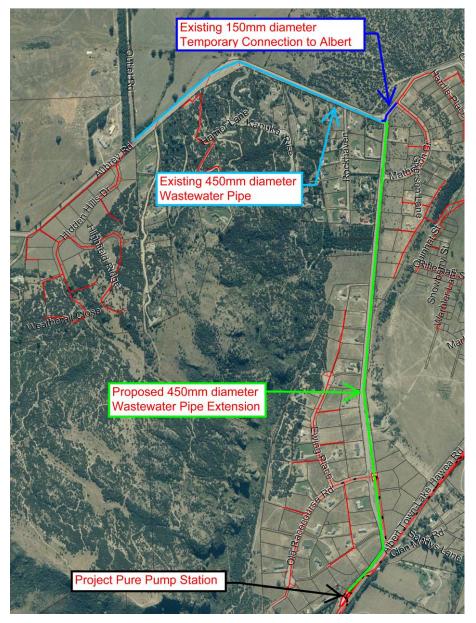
Existing and Proposed Wastewater Reticulation in Aubrey Road
